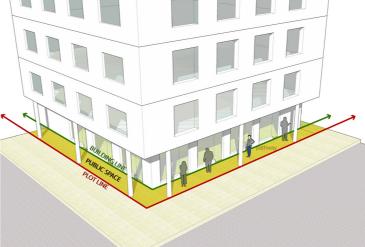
0 M Setback- Building recessed on ground floor to create public space
